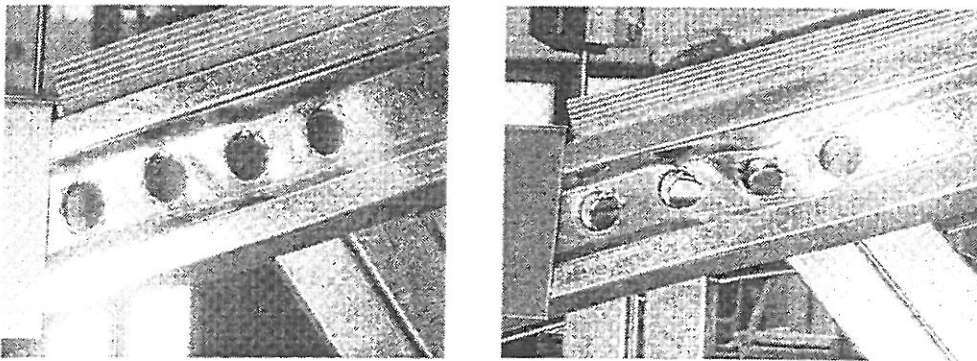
Deformations at the left side Support Area of the Top Chord just before Failure (left) and after Failure (right).
